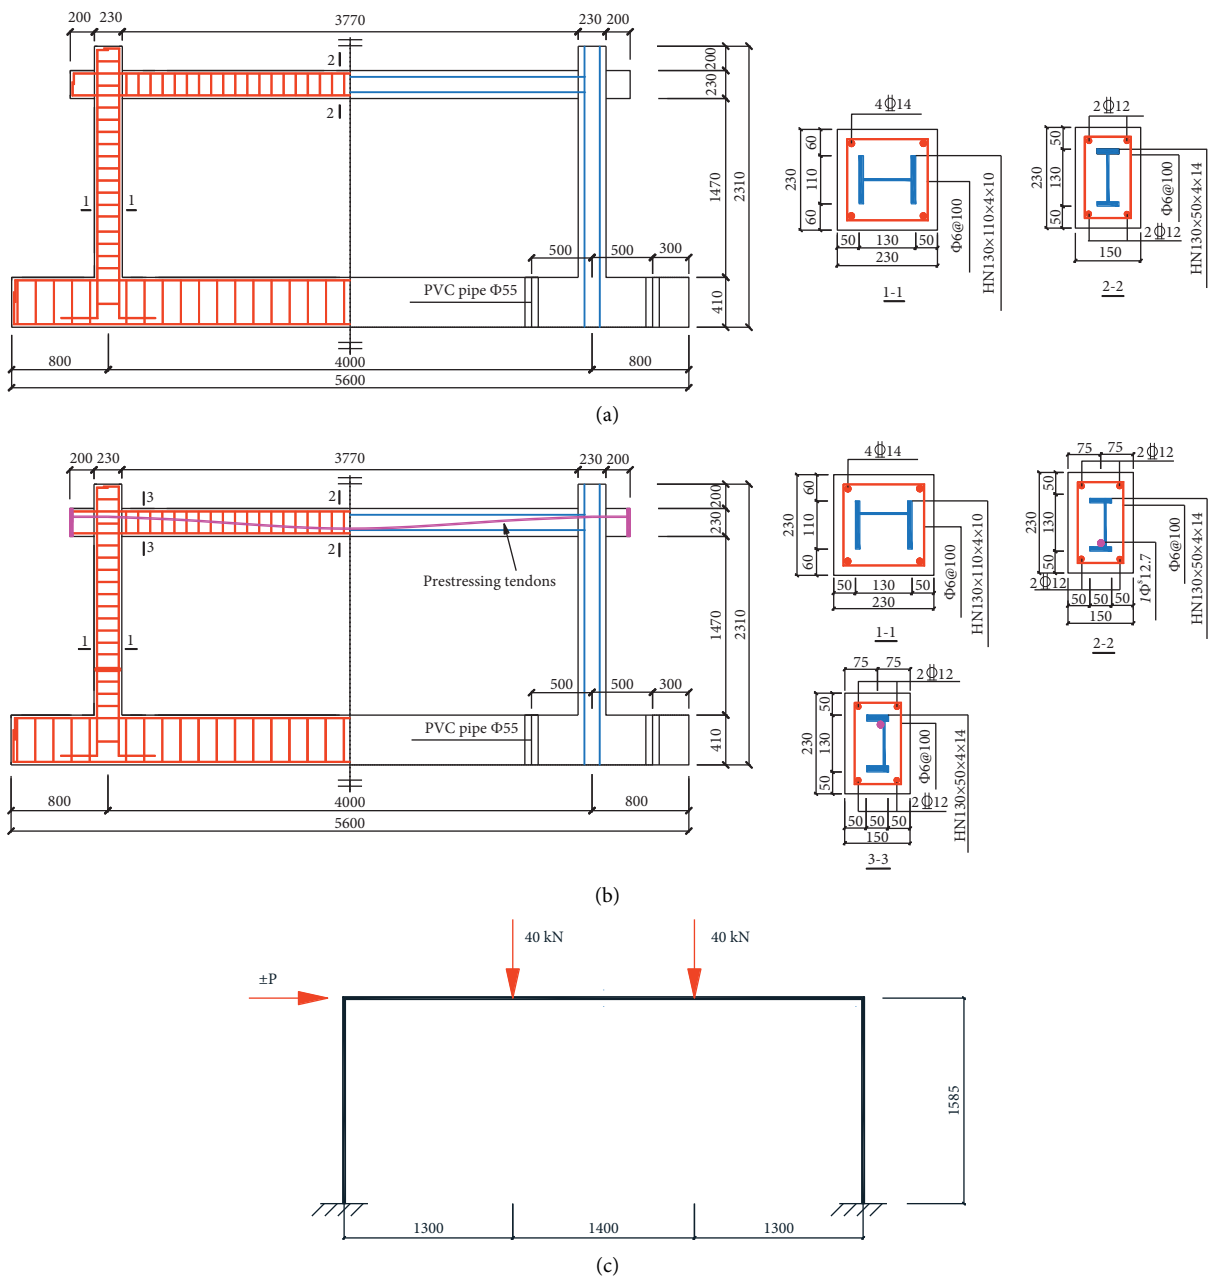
Size of frame specimen. (a) Specimen SRCF. (b) Specimen PSRCF. (c) Loading sketch.
